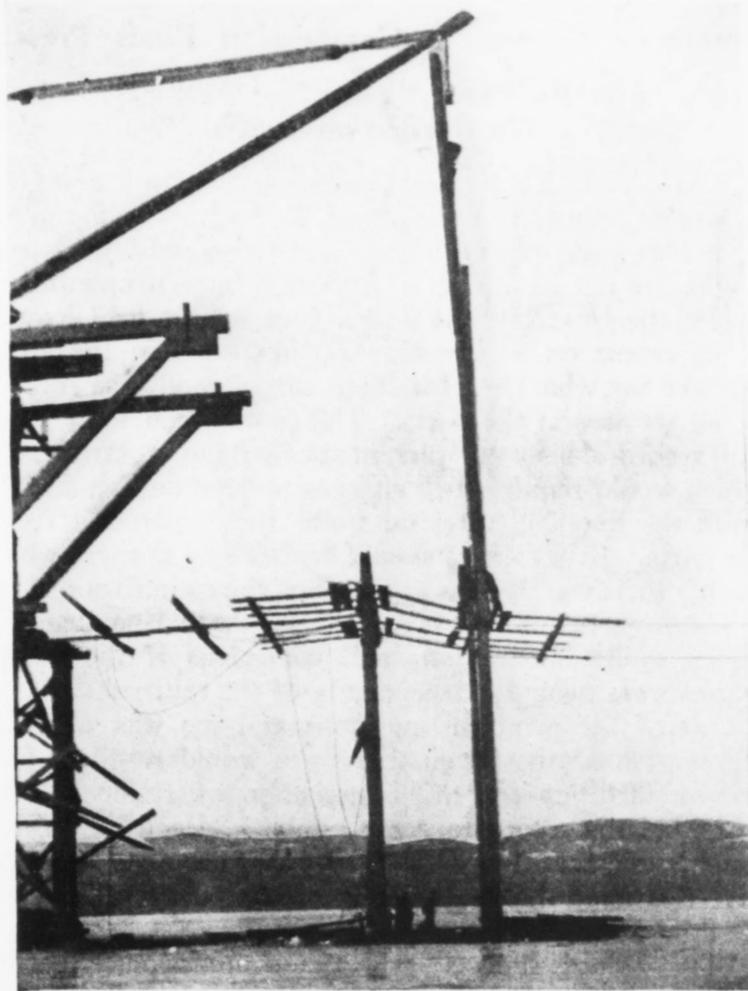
DRIVING 140-FT. FALSEWORK PILING WITH
